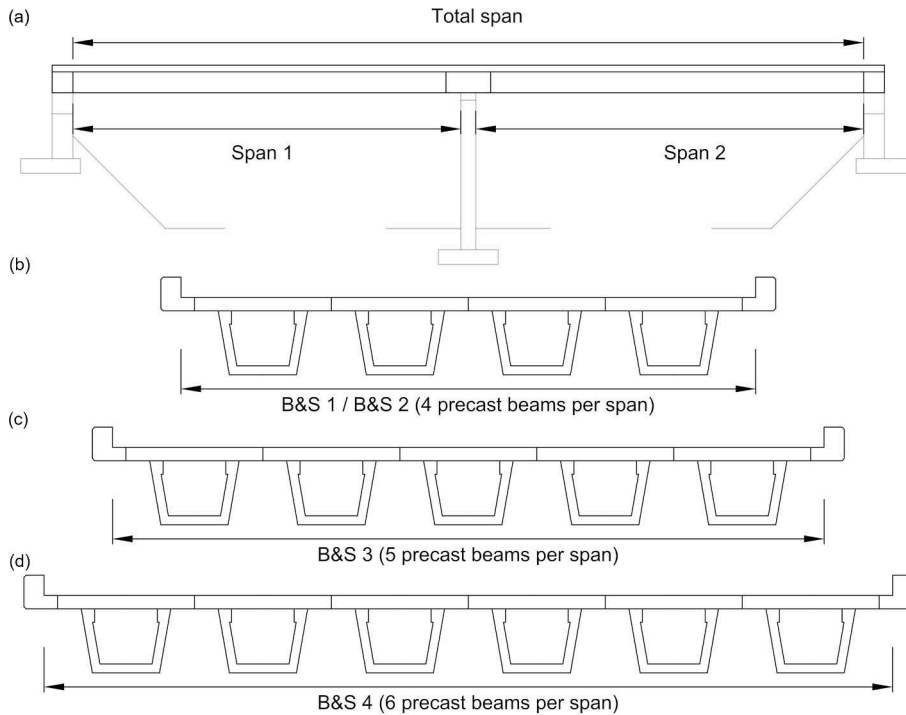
Beam and slab bridge(s): (a) elevation applicable to B&S1 – B&S4, (b) cross-section of B&S1 and B&S2 bridge deck, (c) cross-section of B&S3 bridge deck, (d) cross-section of B&S4 bridge deck.
